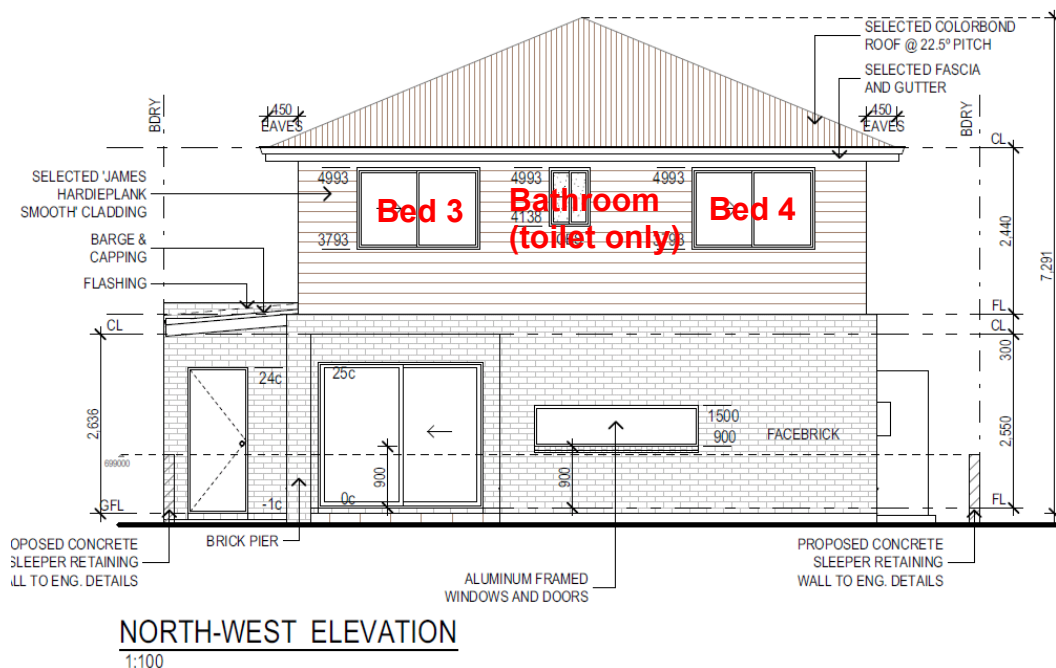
North-west elevation of proposed dwelling on Lot 5.
